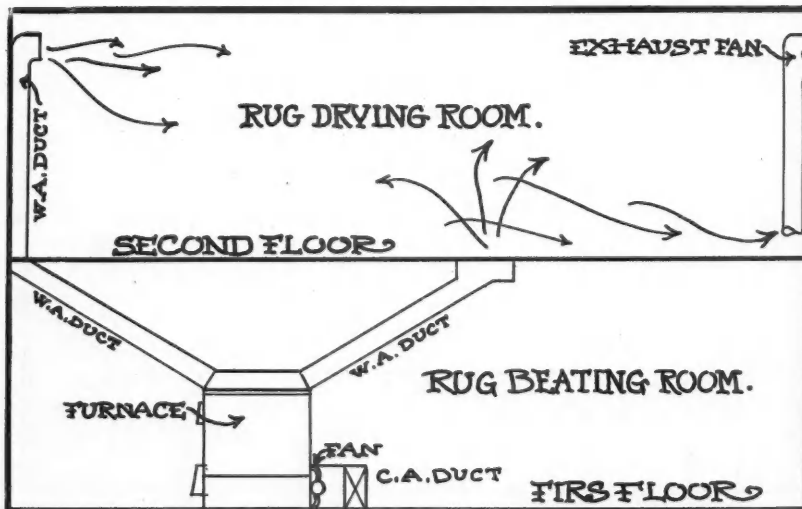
Elevation Showing the Method of Installing Furnace and Heat Ducts in the Building Shown in Fig. 1.
